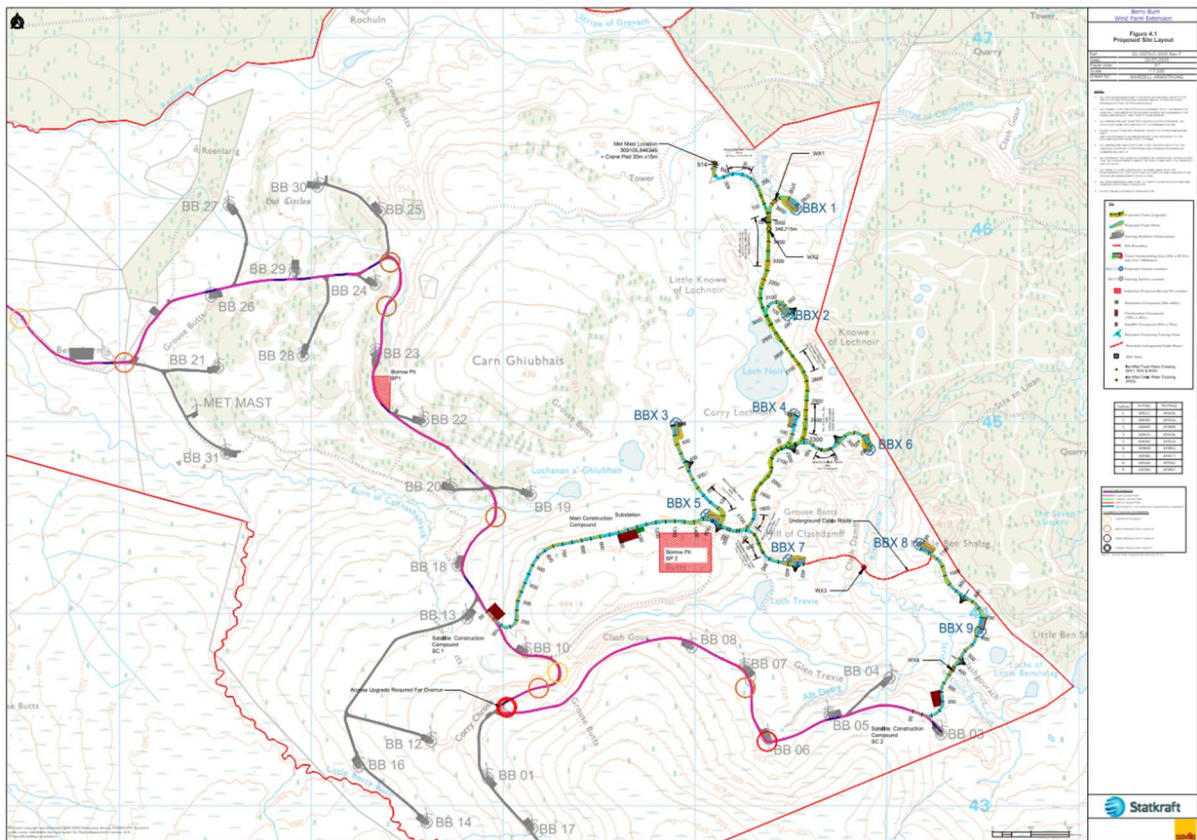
Approved Berry Burn Wind Farm Extension Site Layout Plan
